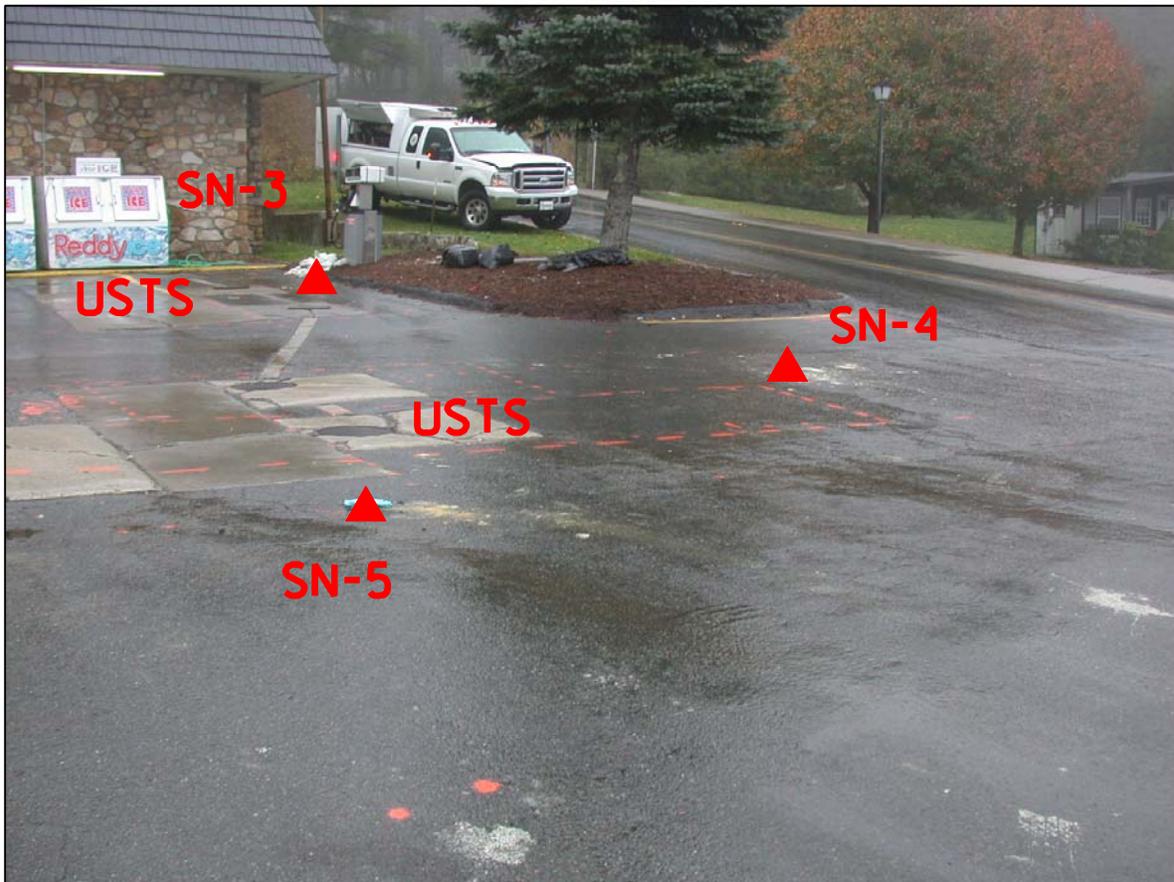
BORINGS AT USTS LOOKING SOUTHEAST
